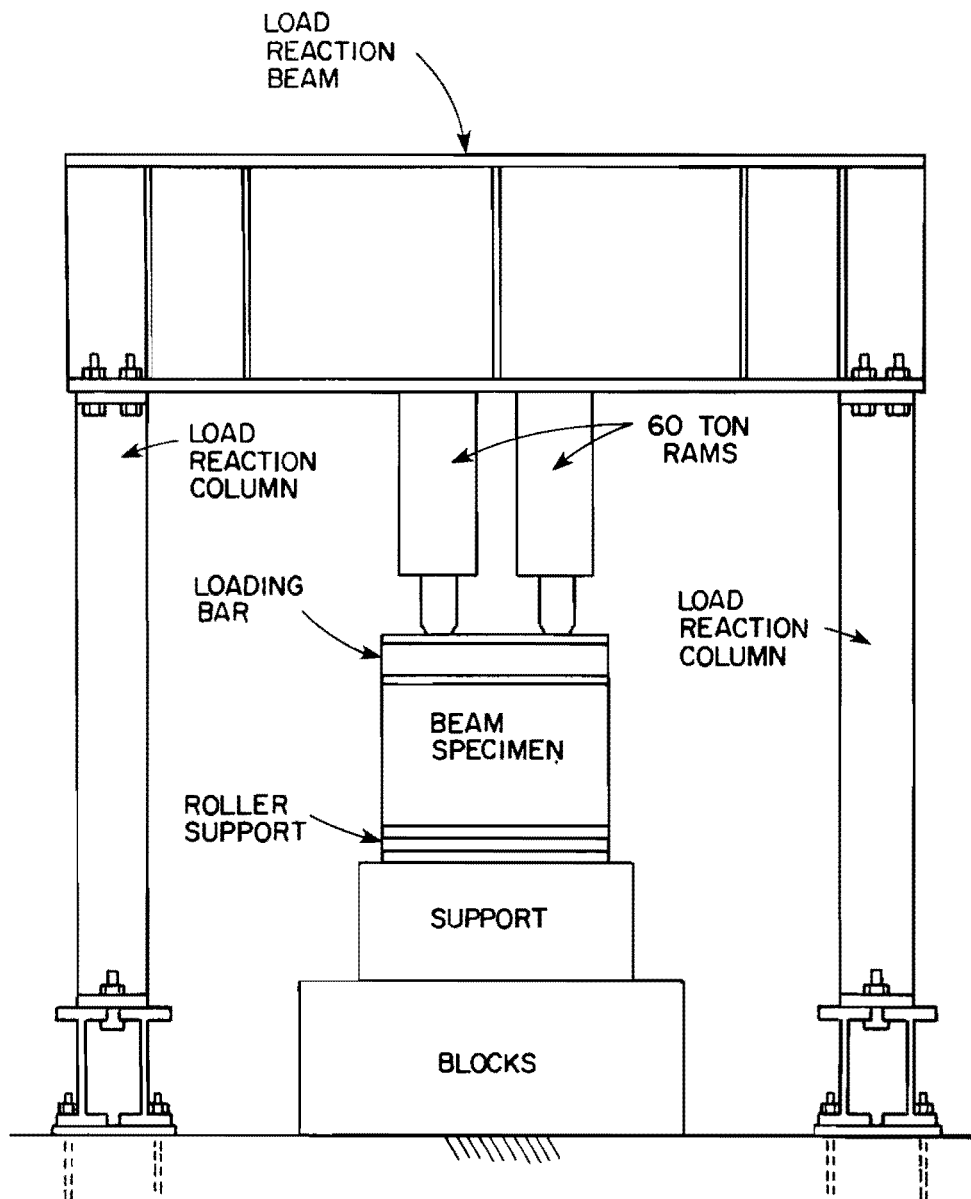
End view of testing frame with rams in place for top cast splice test
